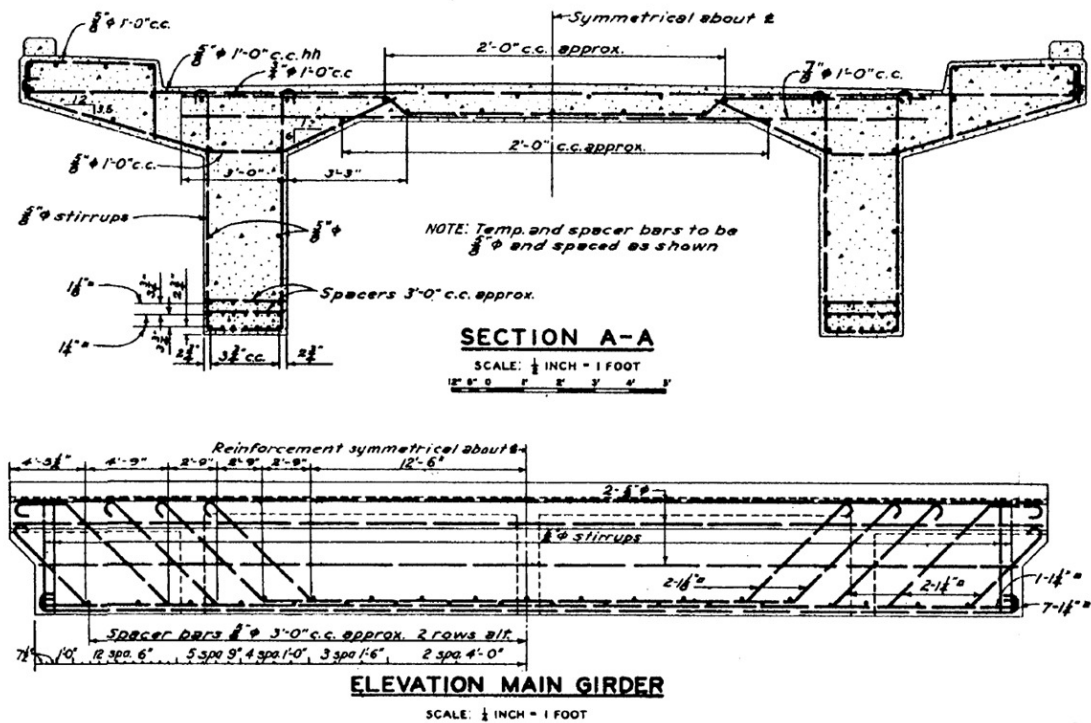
Example bridge section and main girder elevation views (reprinted with permission from USACE). Simply supported girders (span of 16.3 m (53.5 ft) c-c bearings and girder spacing of 5.3 m (17.3 ft) c-c bearings).
